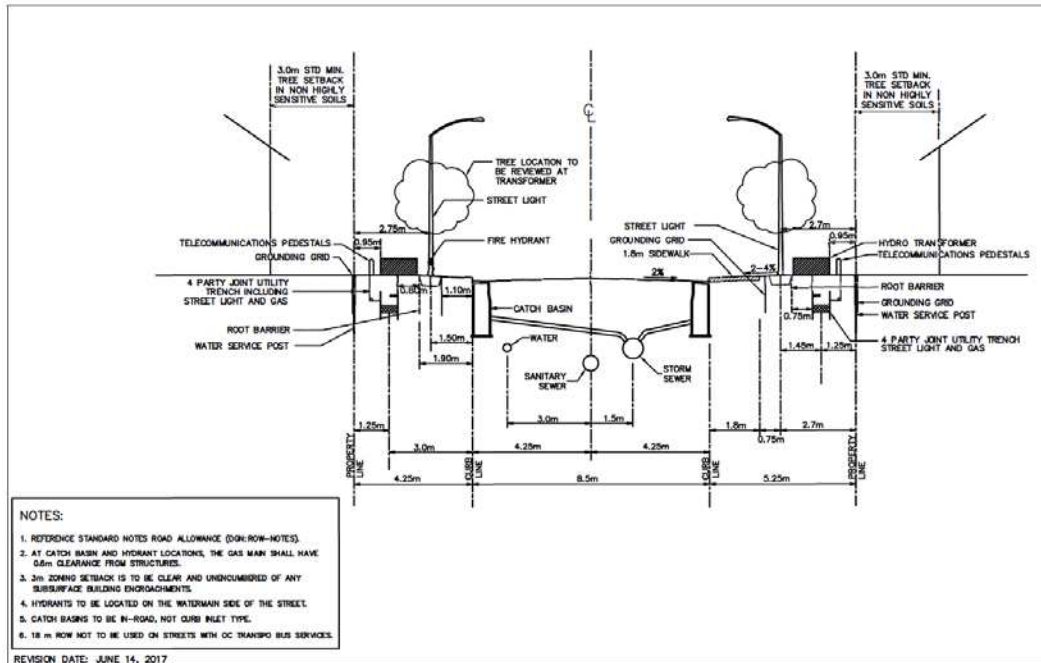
24A – Mixed Frontages Cross Section,
